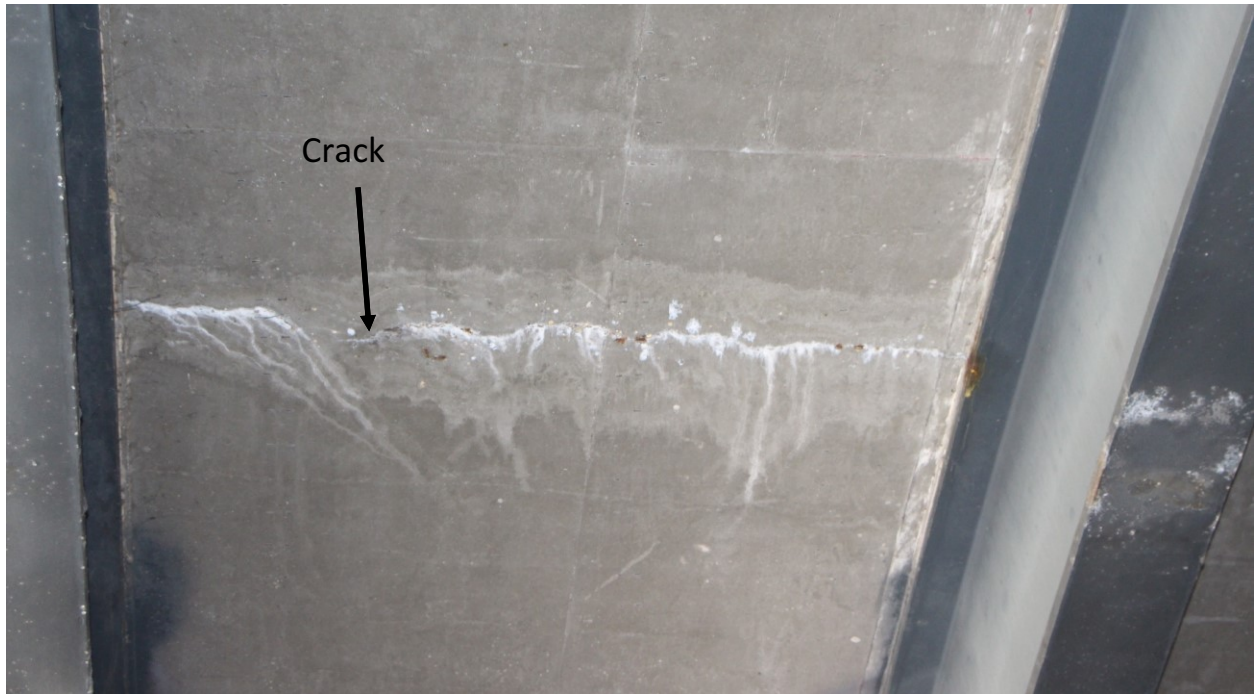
Crack with efflorescence and rust staining on the underside of the deck
